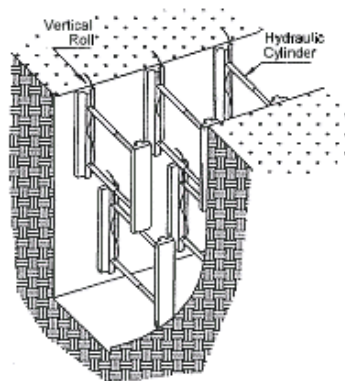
SHORING VARIATIONS: TYPICAL ALUMINUM HYDRAULIC SHORING INSTALLATIONS.
